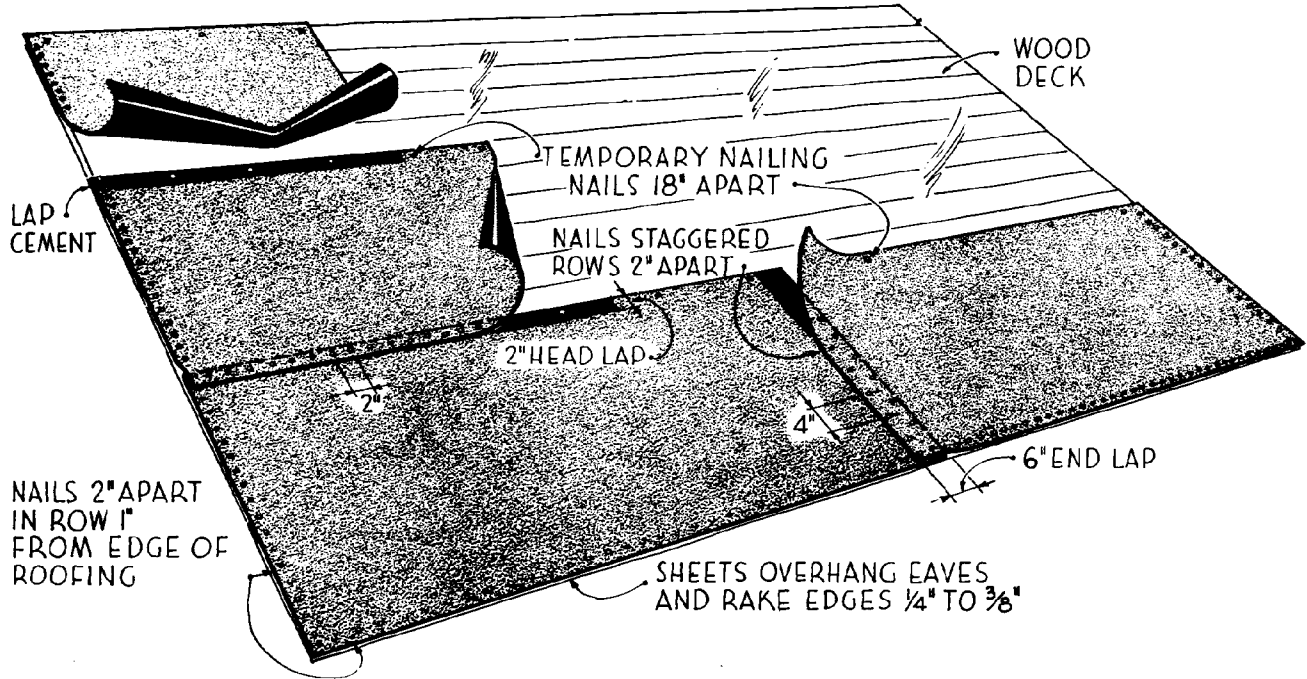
Exposed nail application of roll roofing parallel to the eaves.
